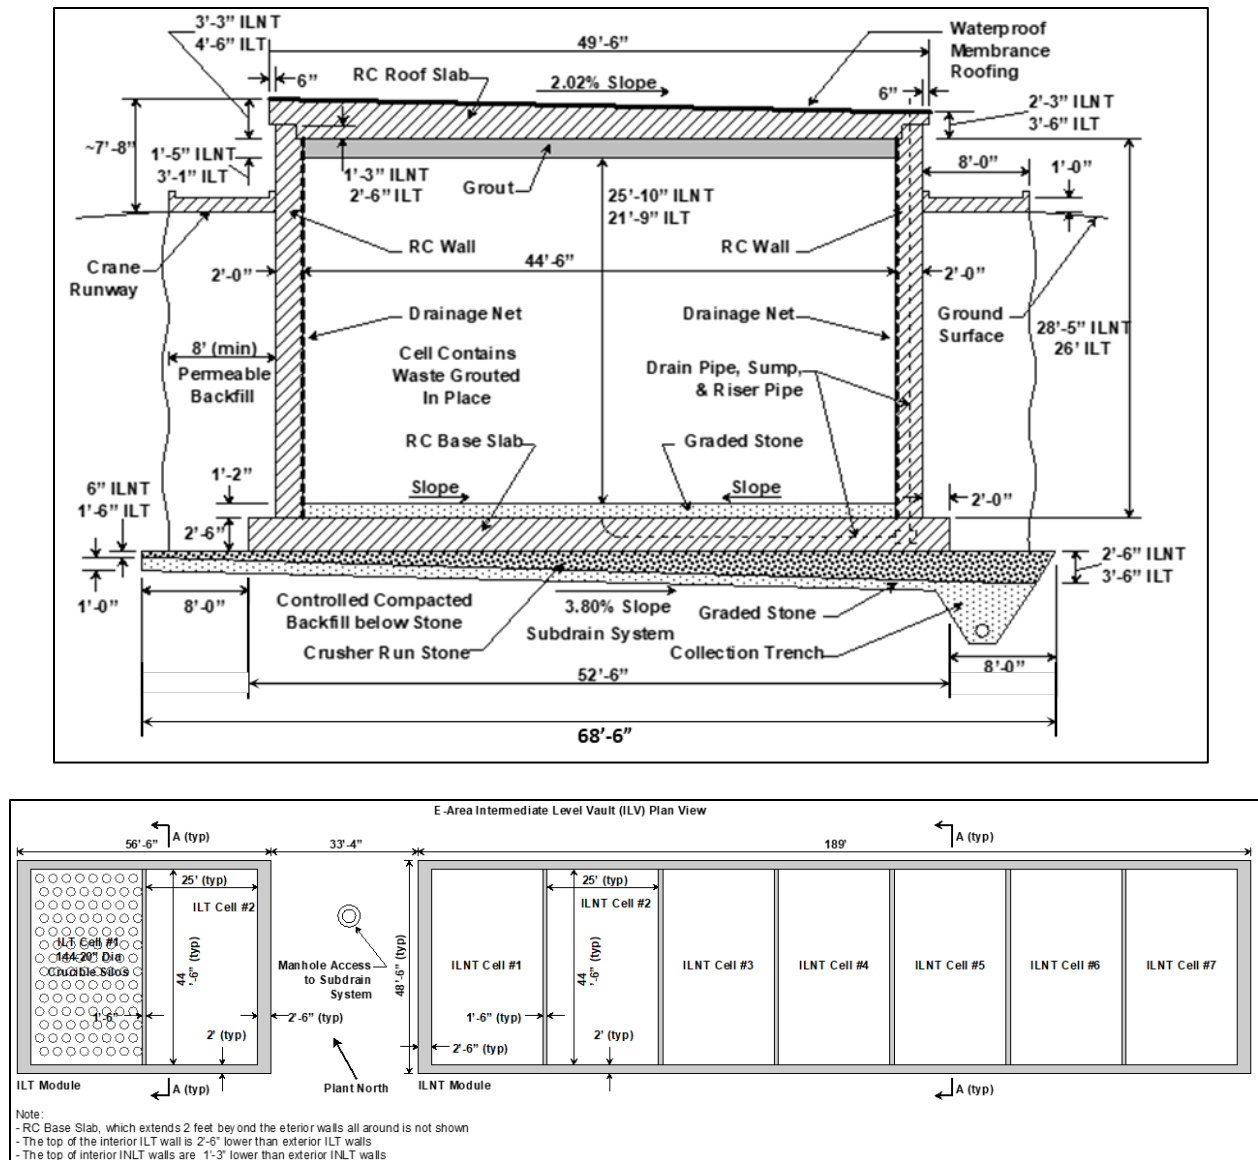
Plan, and Cross-Sectional (A-A) Views of the ILV.
